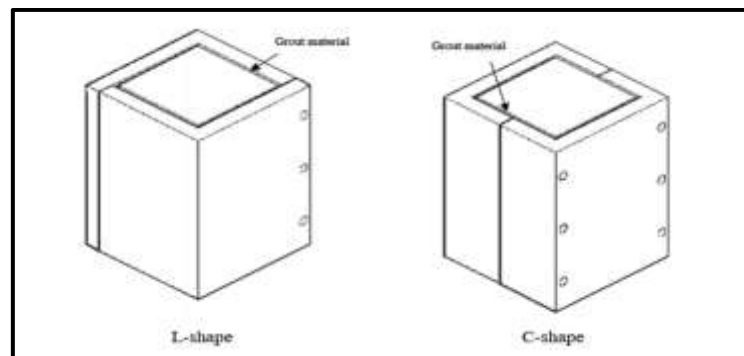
The prefabricated specimens strengthened with ferrocement jacketing. [42].
